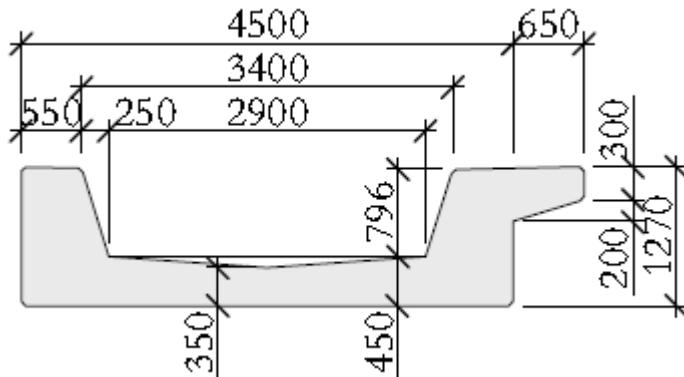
Typical section of a reinforced concrete trough bridge, Enochsson et al (2002)
